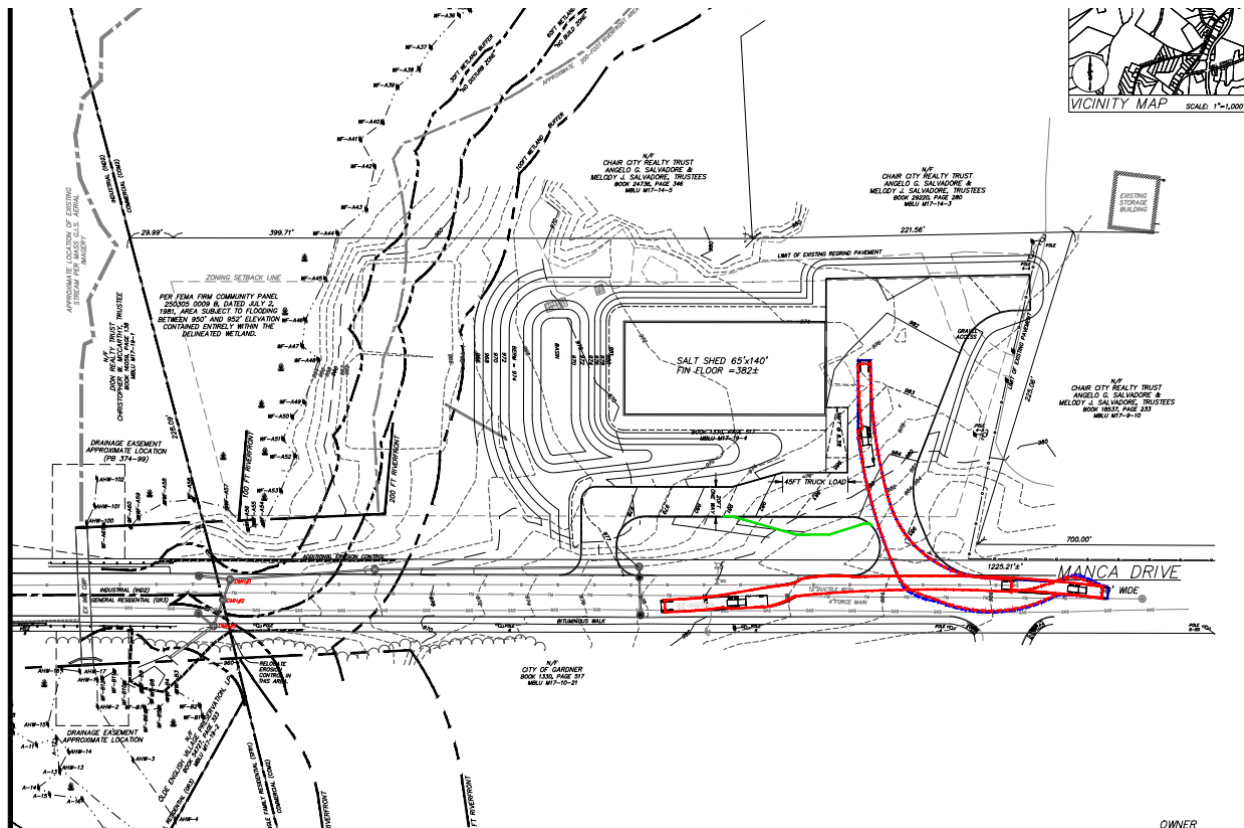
Engineering Content Design by Hannigan Engineering for New Salt Shed Project
